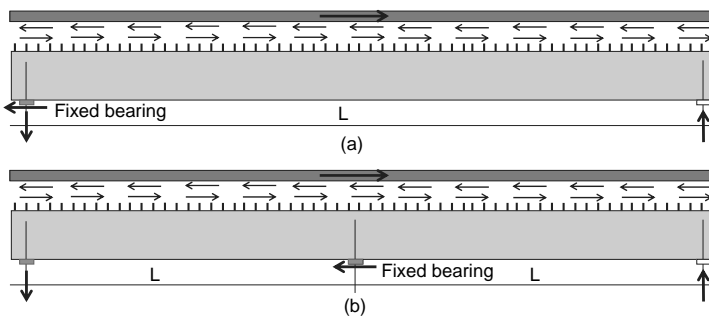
Transfer mechanism of transverse seismic actions for twin I-shaped girders for (a) single span and (b) two span bridges.
